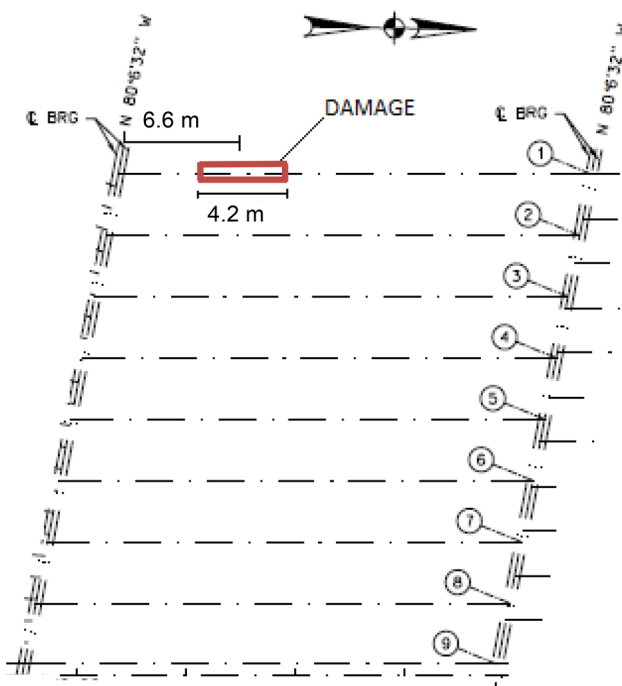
Location of damaged girder on the middle southbound span of bridge 54
